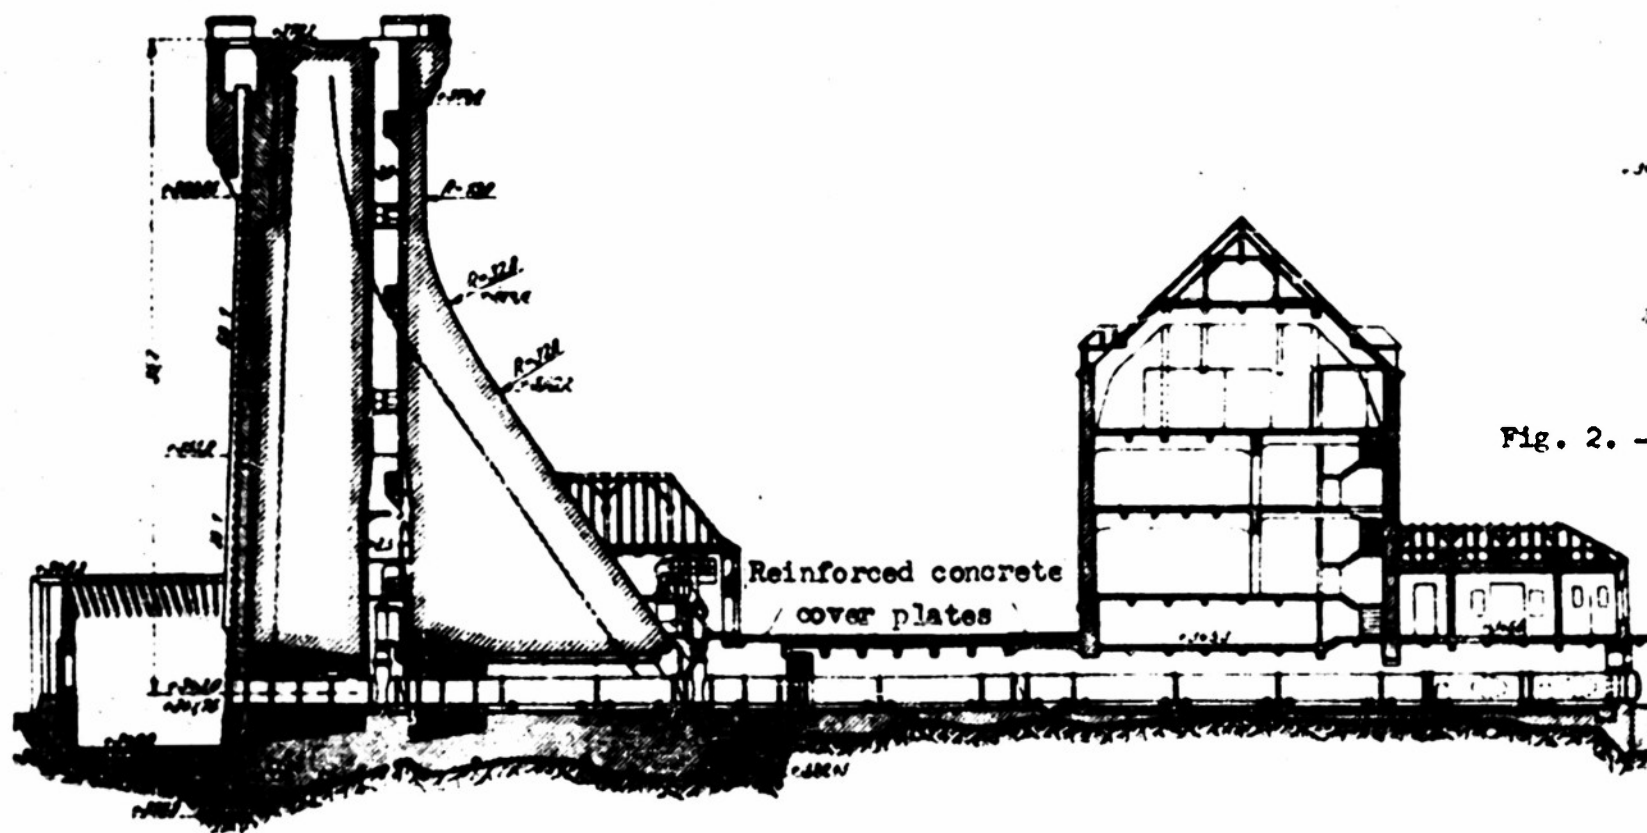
Cross section through the powerhouse (view looking upstream)
